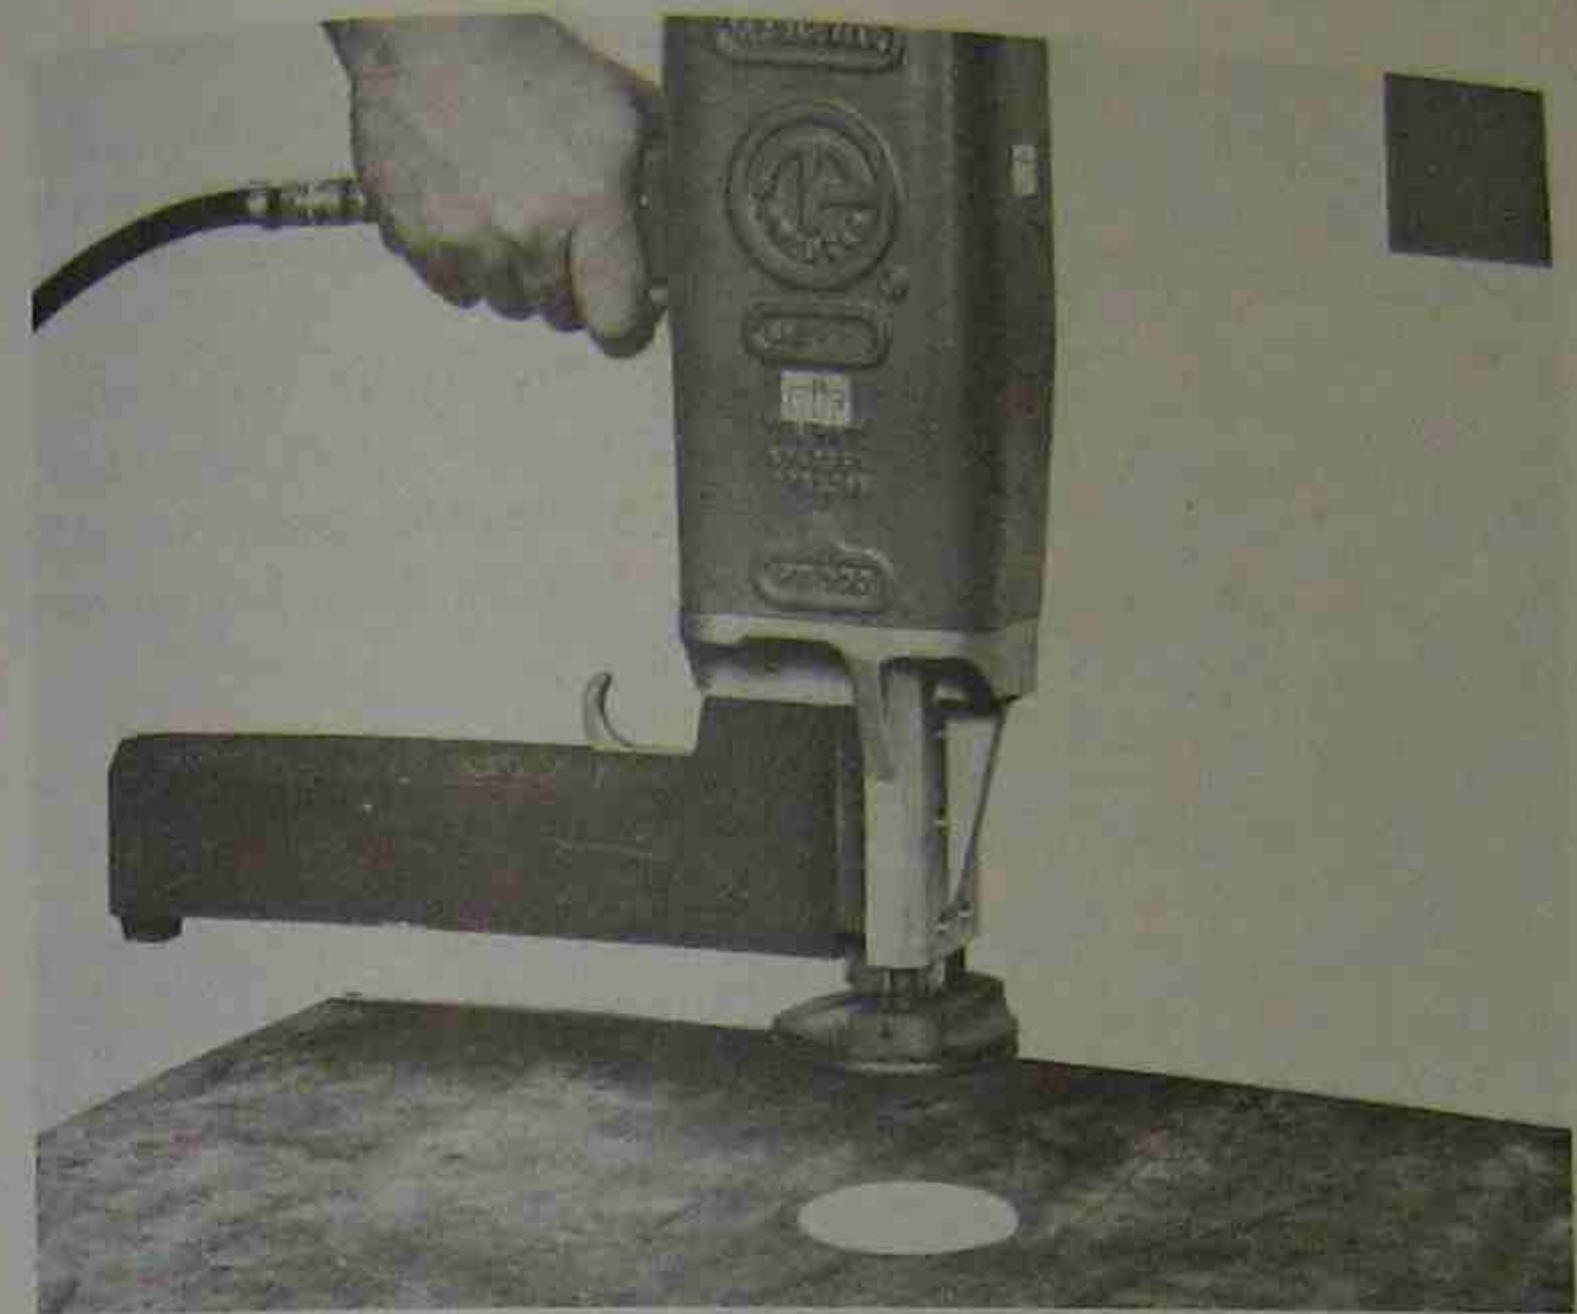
A pneumatic-actuated fixing for insulation board
